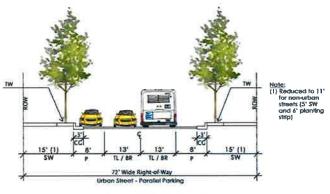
Urban Street (Section S - Parallel Parking)
